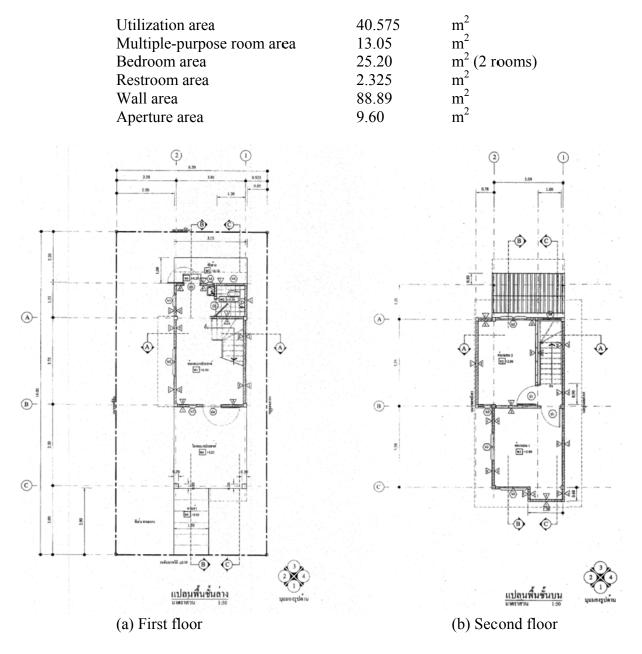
Floor plans of the NHA detached house for low and medium income earners.
